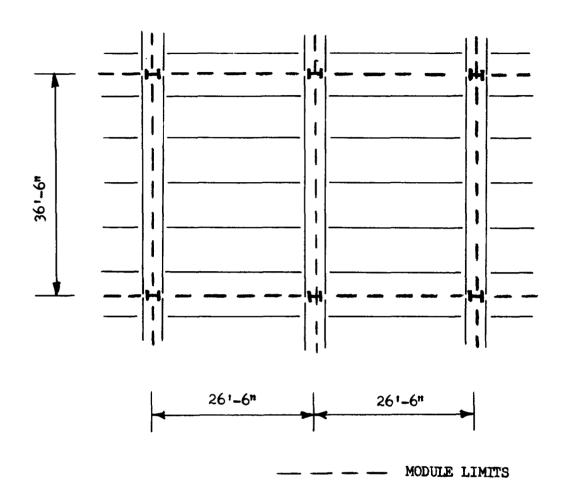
ANNULUS BUILDING, PROPOSED FLOOR STEEL MODULES
